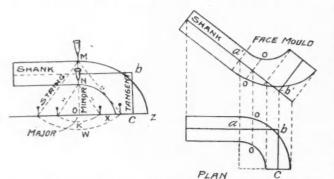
To Layout the Face Mold by Use of Pins and Strings Fig. 3. To Layout the Face Mold by the "Ordinate" Method
